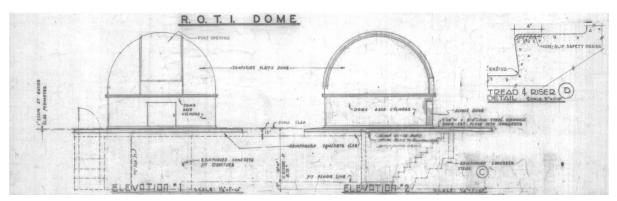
Two elevations of the ROTI reinforced concrete structure with 16-foot diameter astrodome from 1958 WS-HJ plans.
